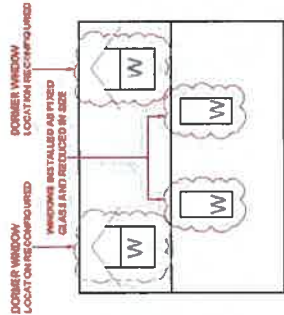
UNIT BLOCK B - WEST ELEVATION
